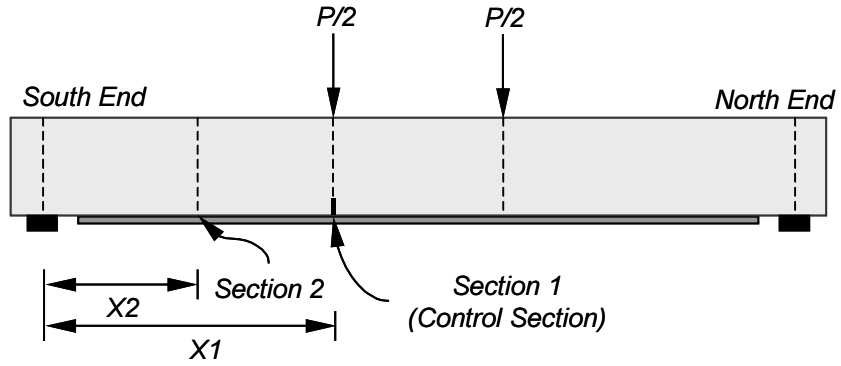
Position of Instrumented Sections for 8-in. by 14-in. Beams
